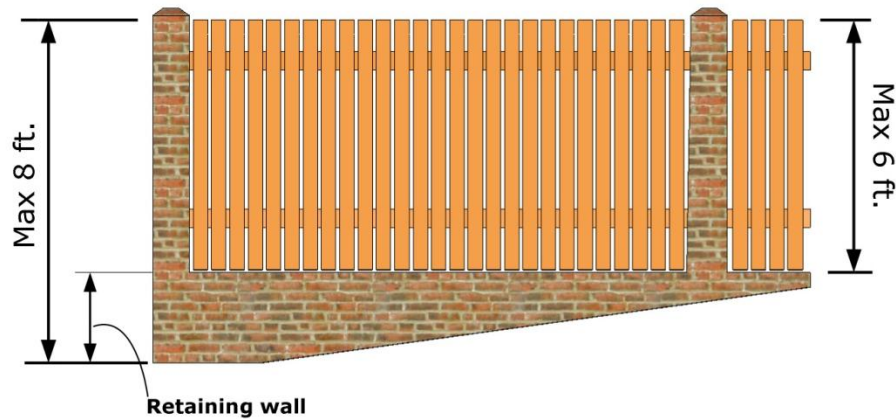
Fence and Retaining Wall Combination; 17.7.8.2:D
